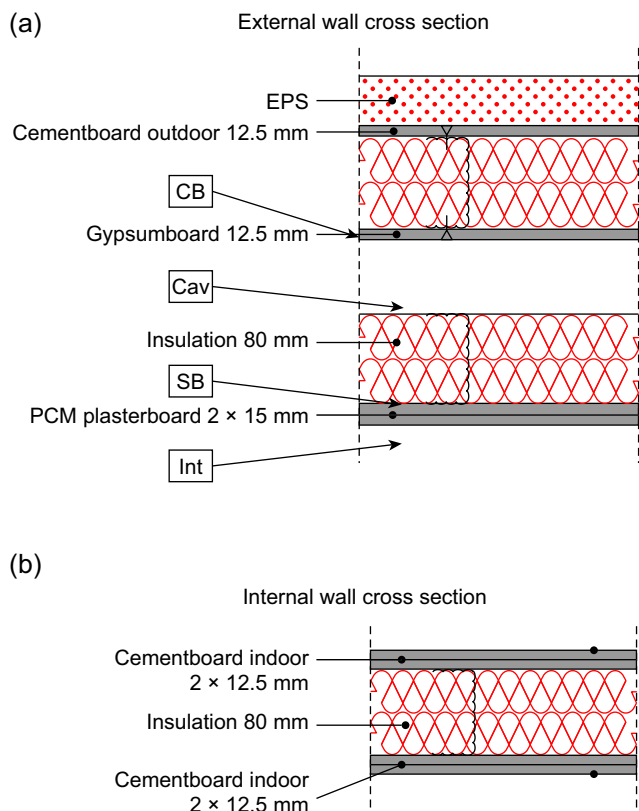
Cross section of (a) the external wall (“CB,” “Cav,” “SB,” and “Int” correspond to temperature sensors placed in the LVR east wall); (b) the partition wall with cement boards (Mandilaras et al., 2013).
